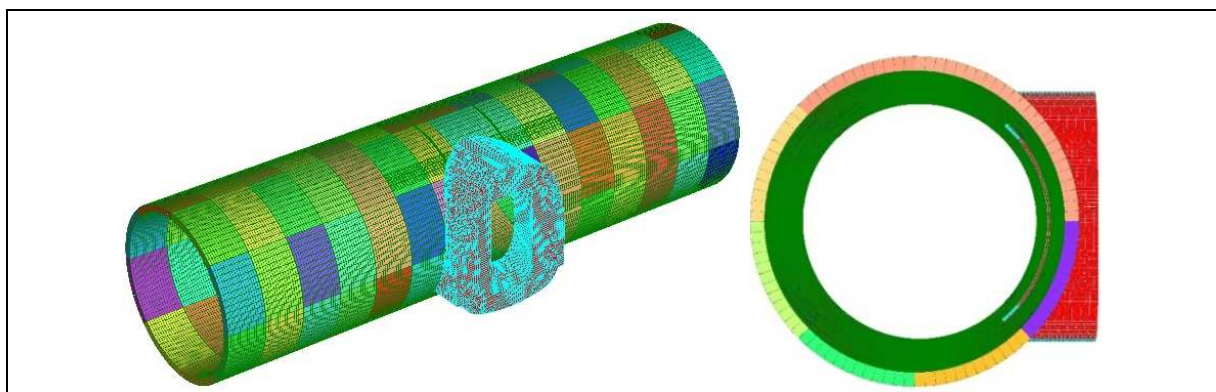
Stages 4 and 5 of multi-staged modelling: Permanent reinforced concrete collar in-situ casting prior and after dismantling the steel frame
